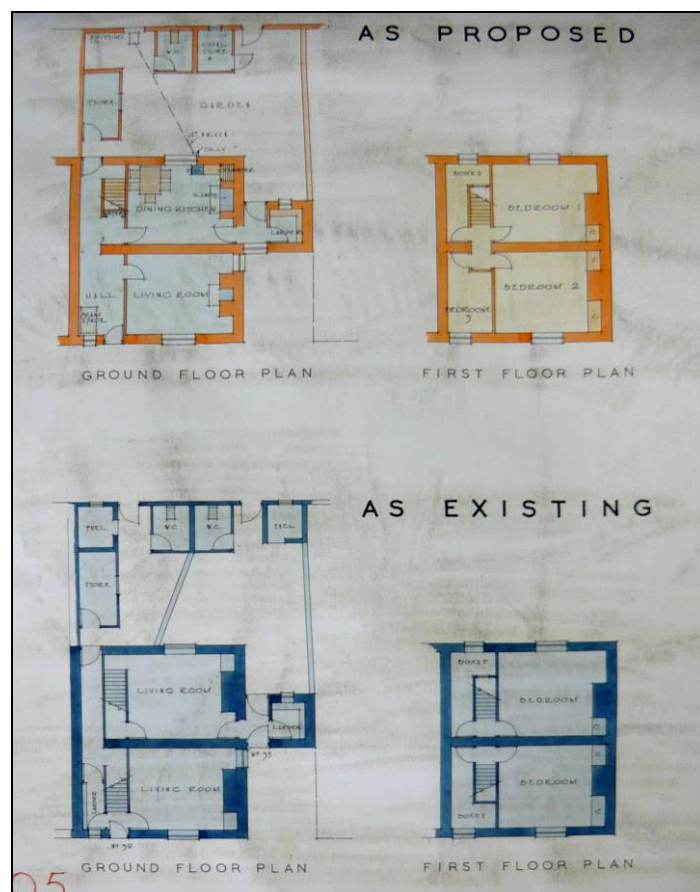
Building control plans for No's 35 & 36 South Street, Newbottle dated 1940
